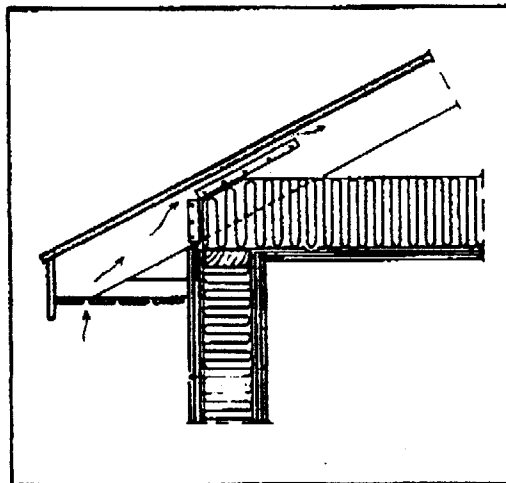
Detail of a typical Nordic eaves design, (Trehus 80, håndbok 34, NBI, 1982)
